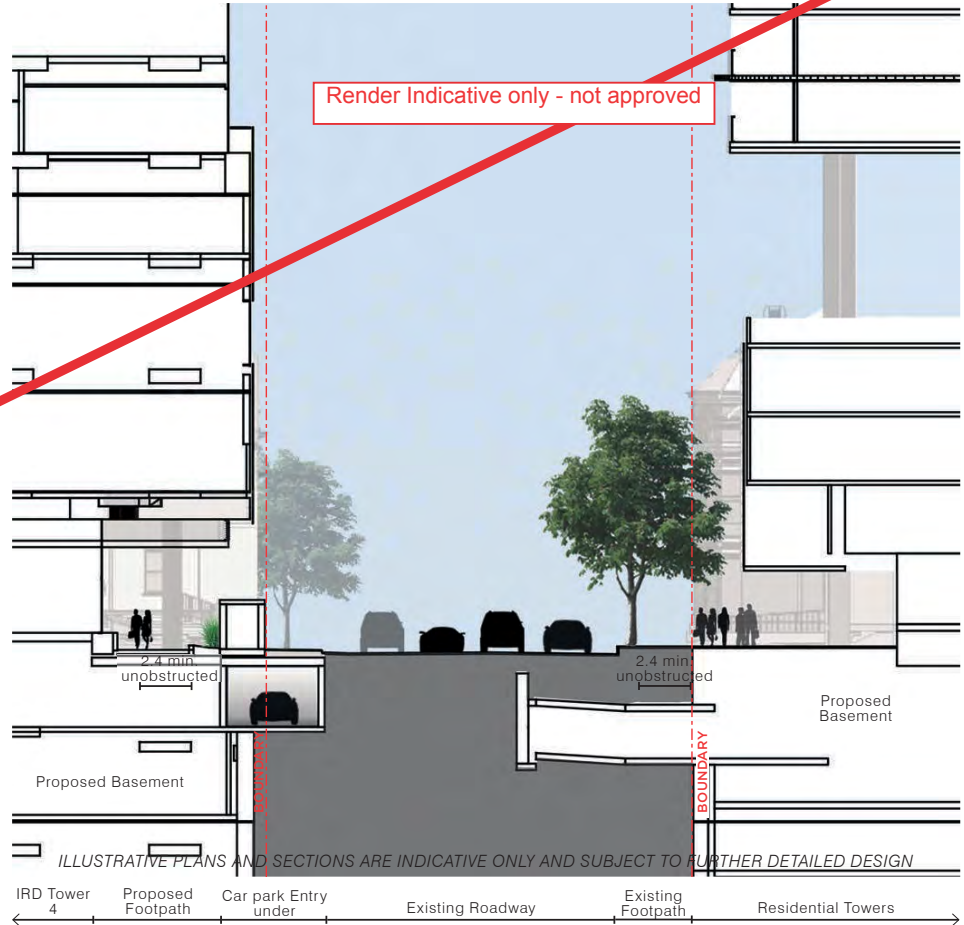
Margaret Street sectional elevation at The IRD and Residential Towers
